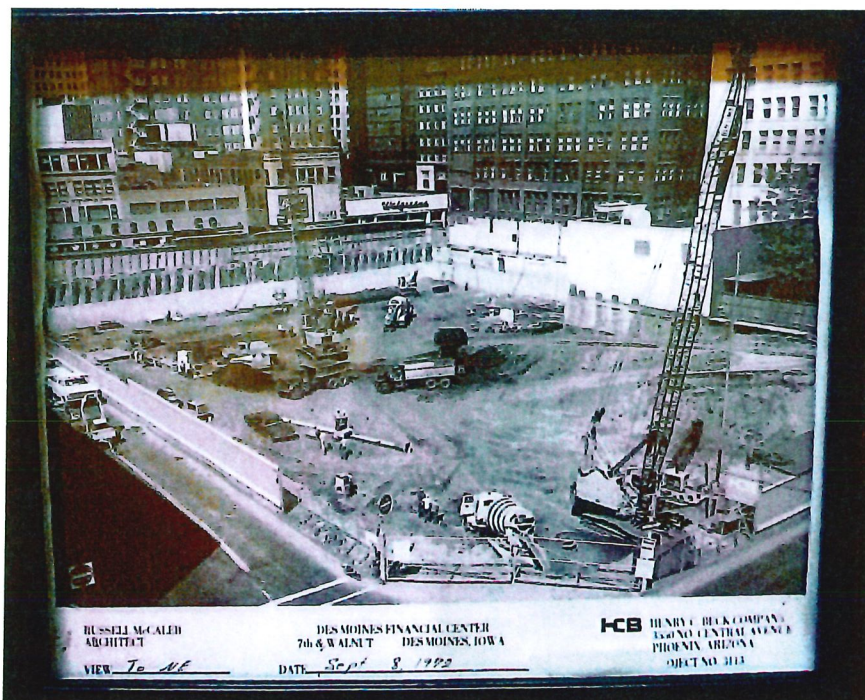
Figure: September 1972 progress photograph shows the site excavation status, view looking northeast from the corner of Seventh and Mulberry streets. Taken by Henry C. Beck Co. (Financial Center files)
